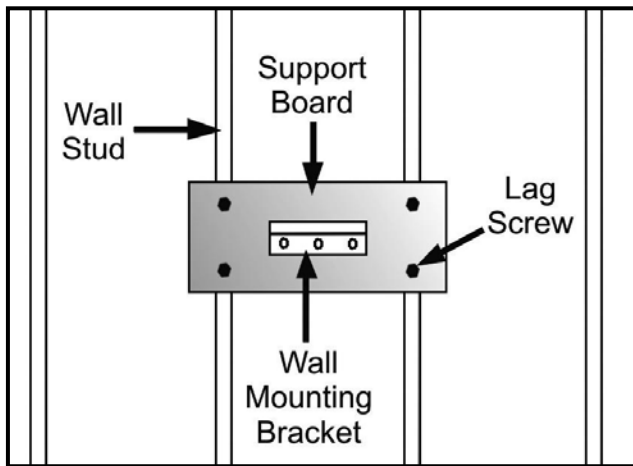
Installing wall mounting bracket on a support board on the wall studs
